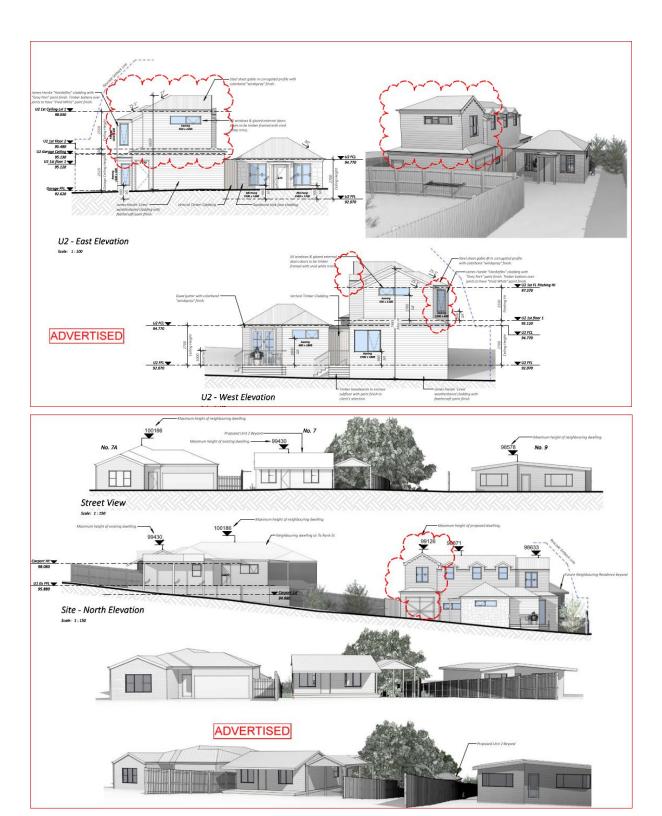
Unit Developments Latest Exhibited Plans and Elevations
